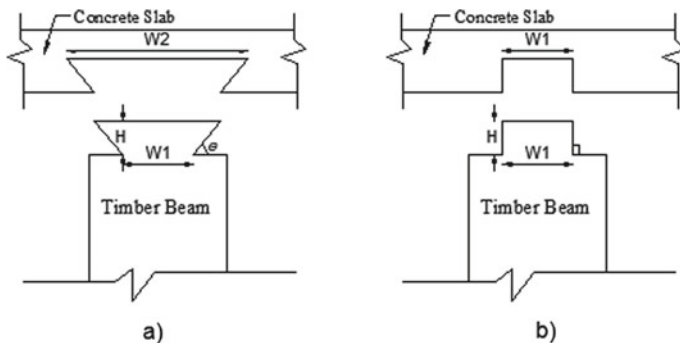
Schematic view of the model drawn in AutoCAD a) Dovetail joint b) Rectangular joint
